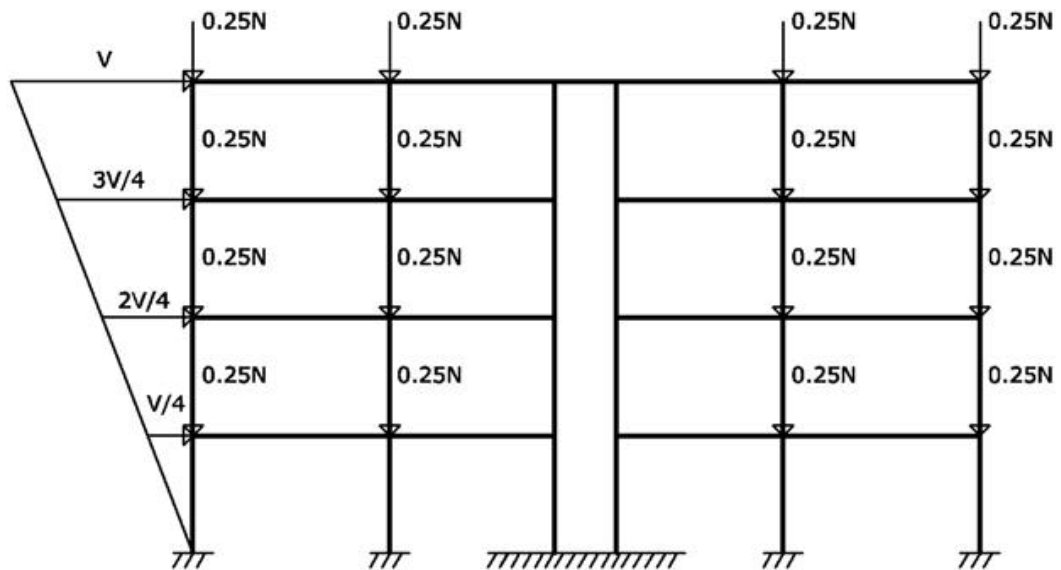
Profile of Lateral Force Applied to the Building Structure
